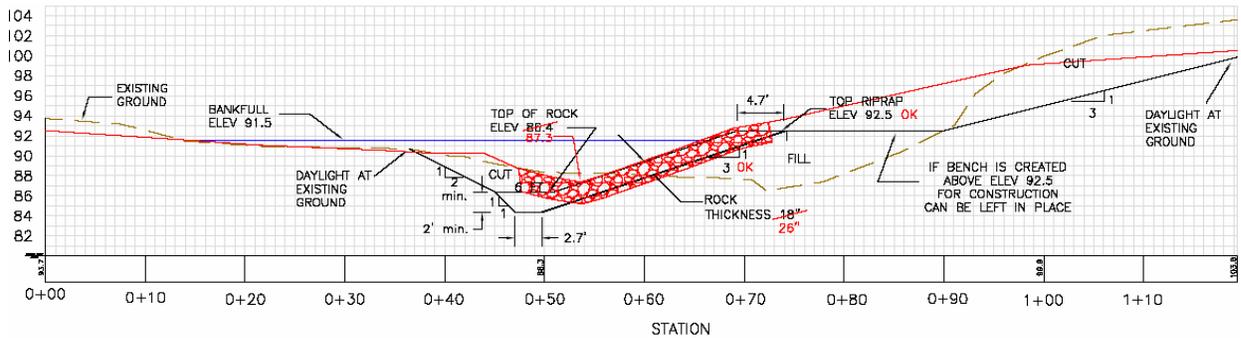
Stream cross-section showing as-built riprap downstream of crossing (looking downstream)
